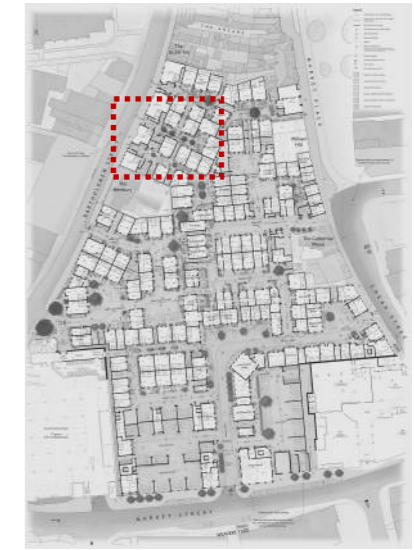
Ground Floor Layout of Artist's Mews (South).
